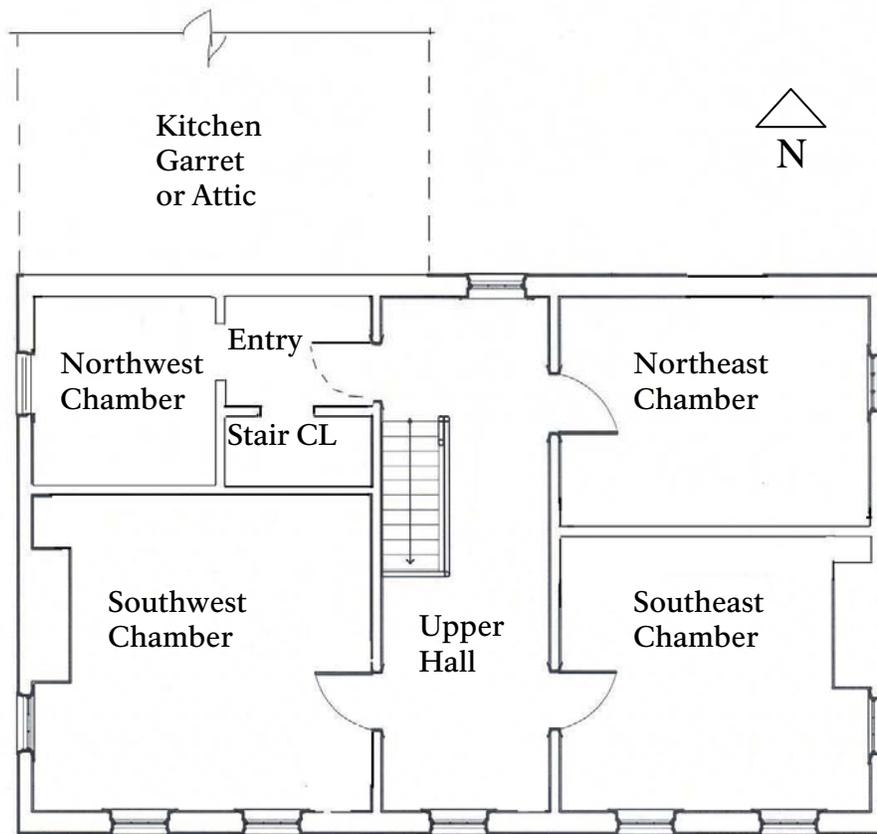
Conjectural second-floor plan of the Hunt House, circa 1828. Not to scale.
